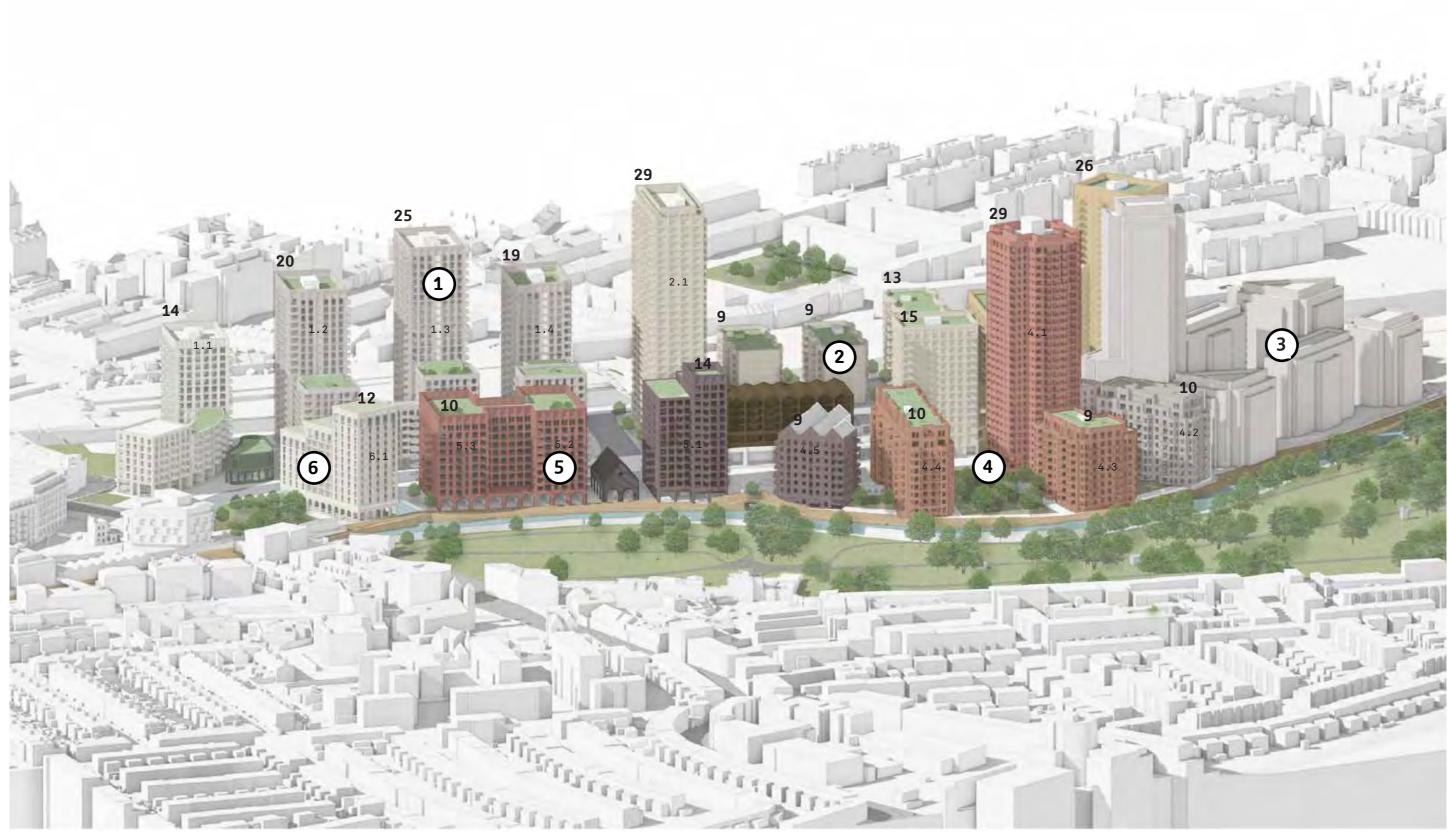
Storey heights of buildings within the illustrative masterplan.
